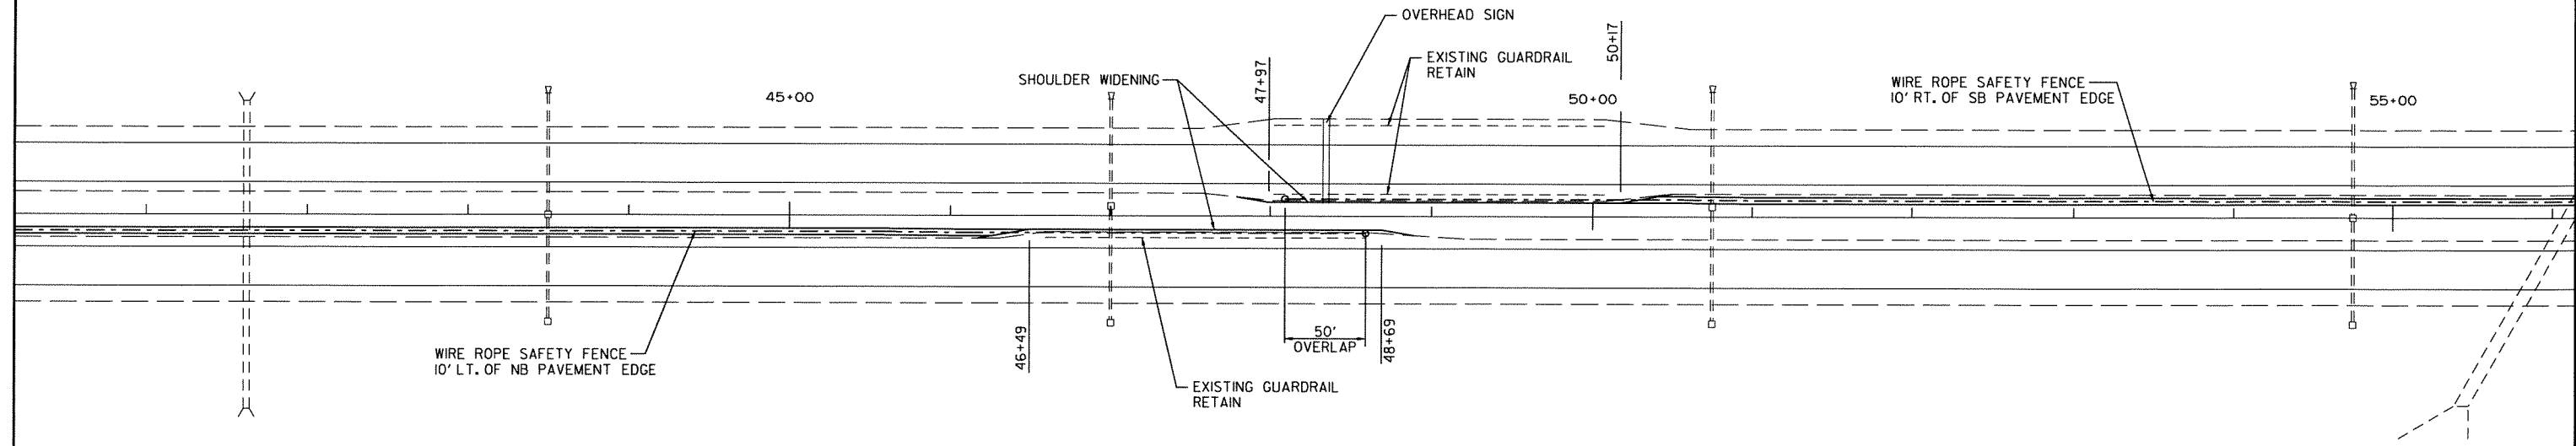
DETAIL AT RAILROAD OVERPASS AND OVERHEAD SIGN STRUCTURE
